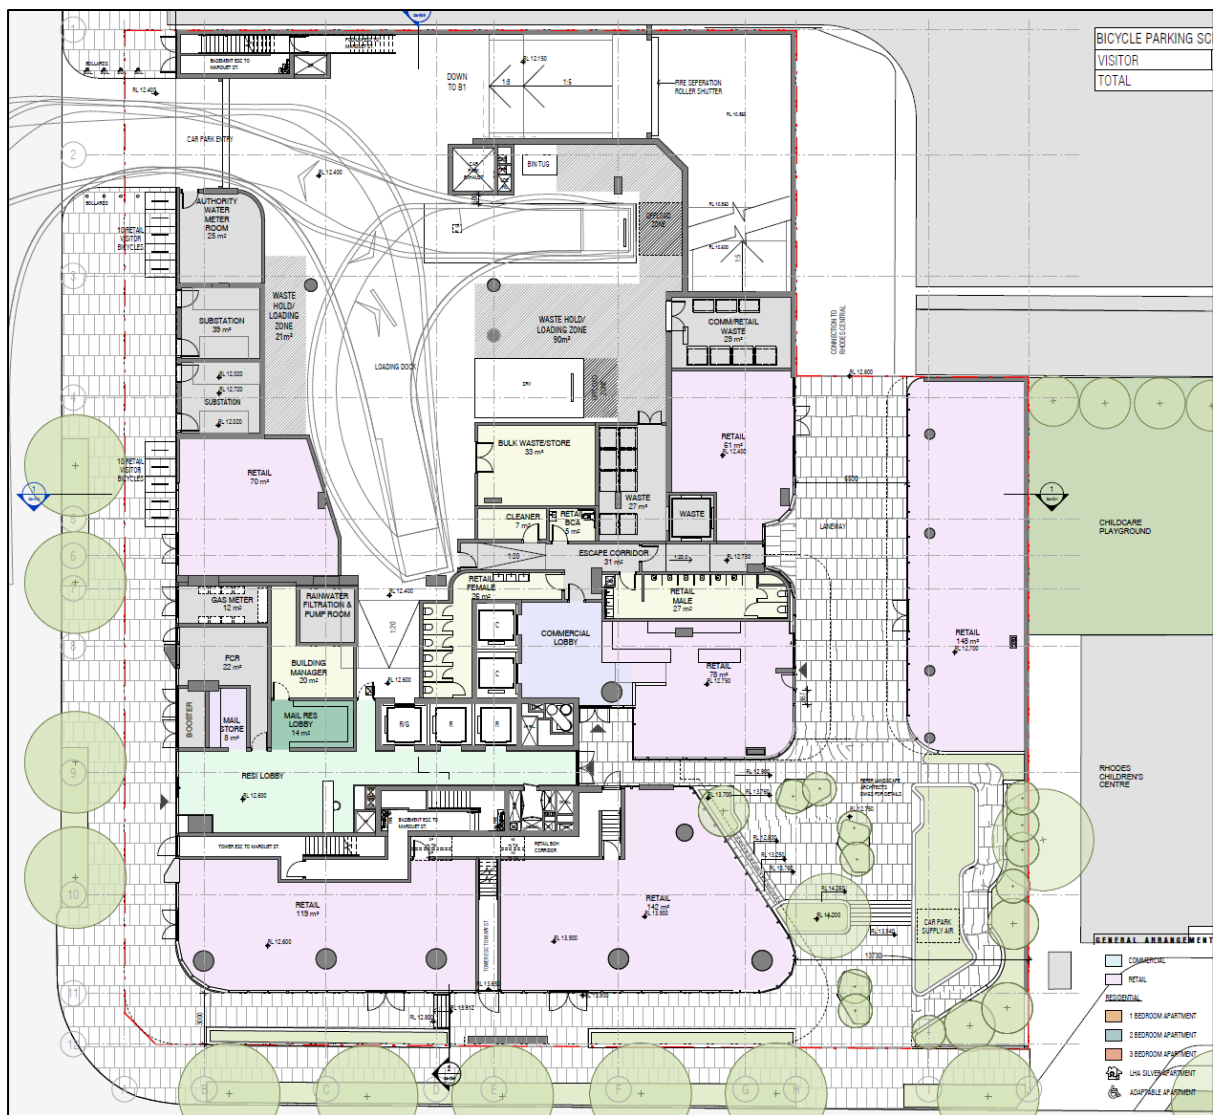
| Proposed ground floor (Source: Applicant's Architectural Plans Rev D dated 28 March 2024)
